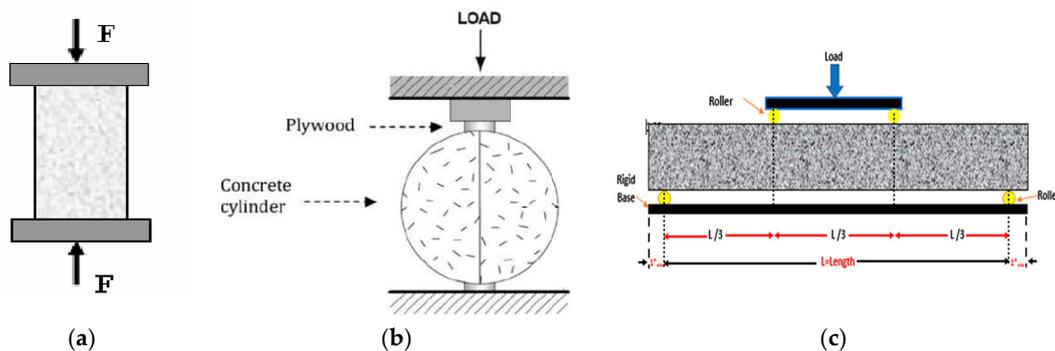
Strength testing machine mechanism (a) compressive, (b) tensile, (c) flexural tests.
